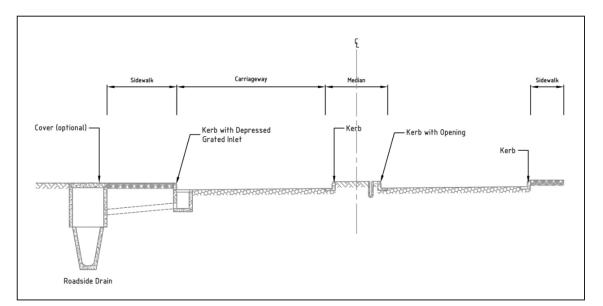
Road Drainage System and Stormwater Inlets (REAM, 2002)
